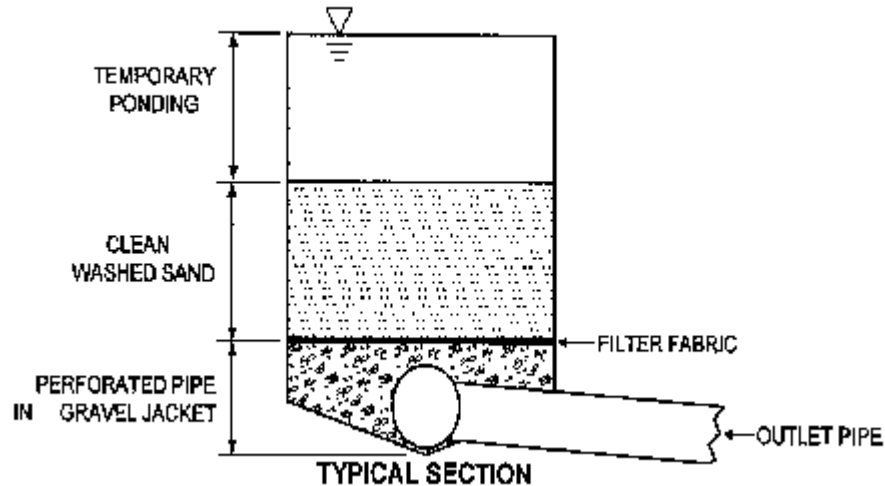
Typical Sand Filter Media Cross Sections
